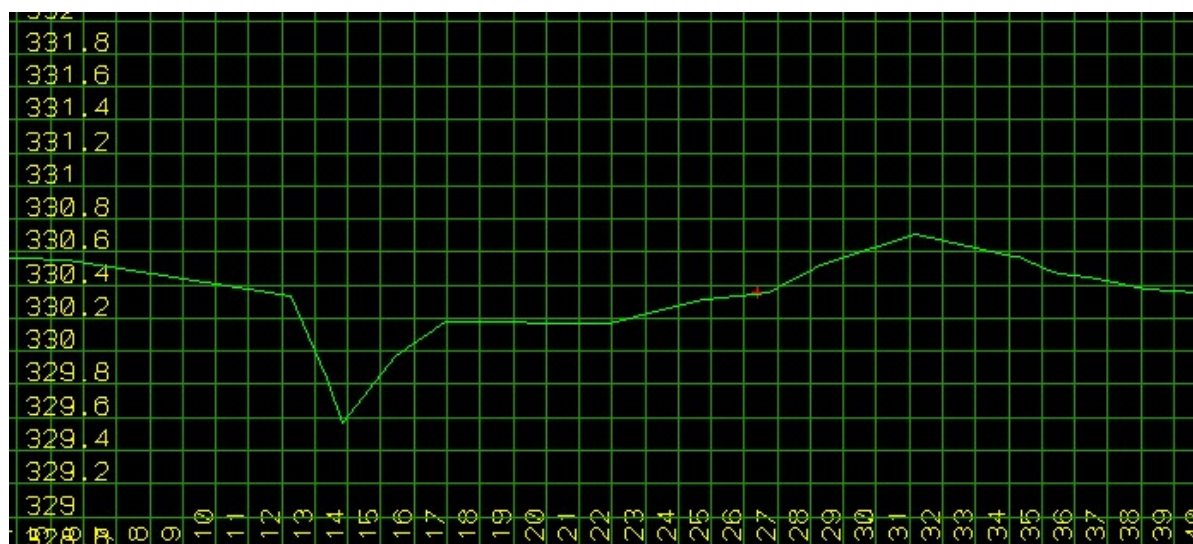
Typical existing cross section south of School (Note road carriageway is from CH 28 – 34), 5m easement is from 21 to 26
